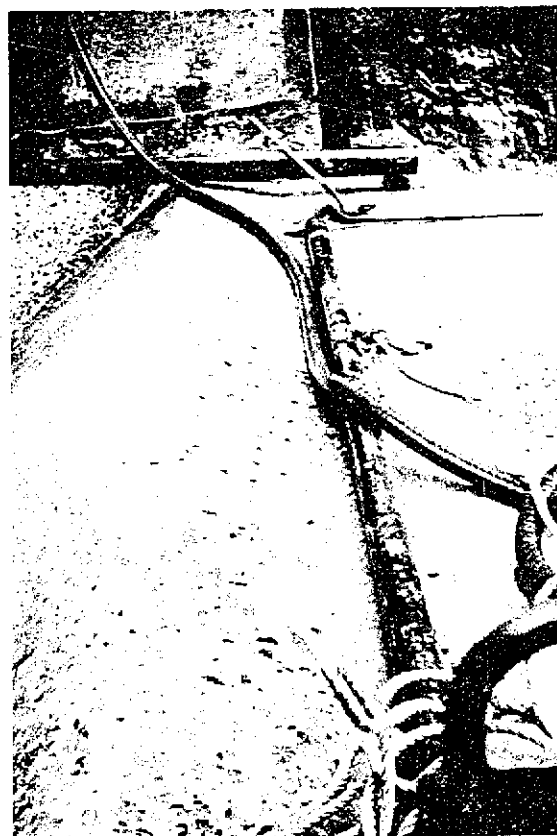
Eroded concrete surfaces downstream of bucket lip. Stoplog seal plate is undamaged. Photo P459-D-55583 NA
